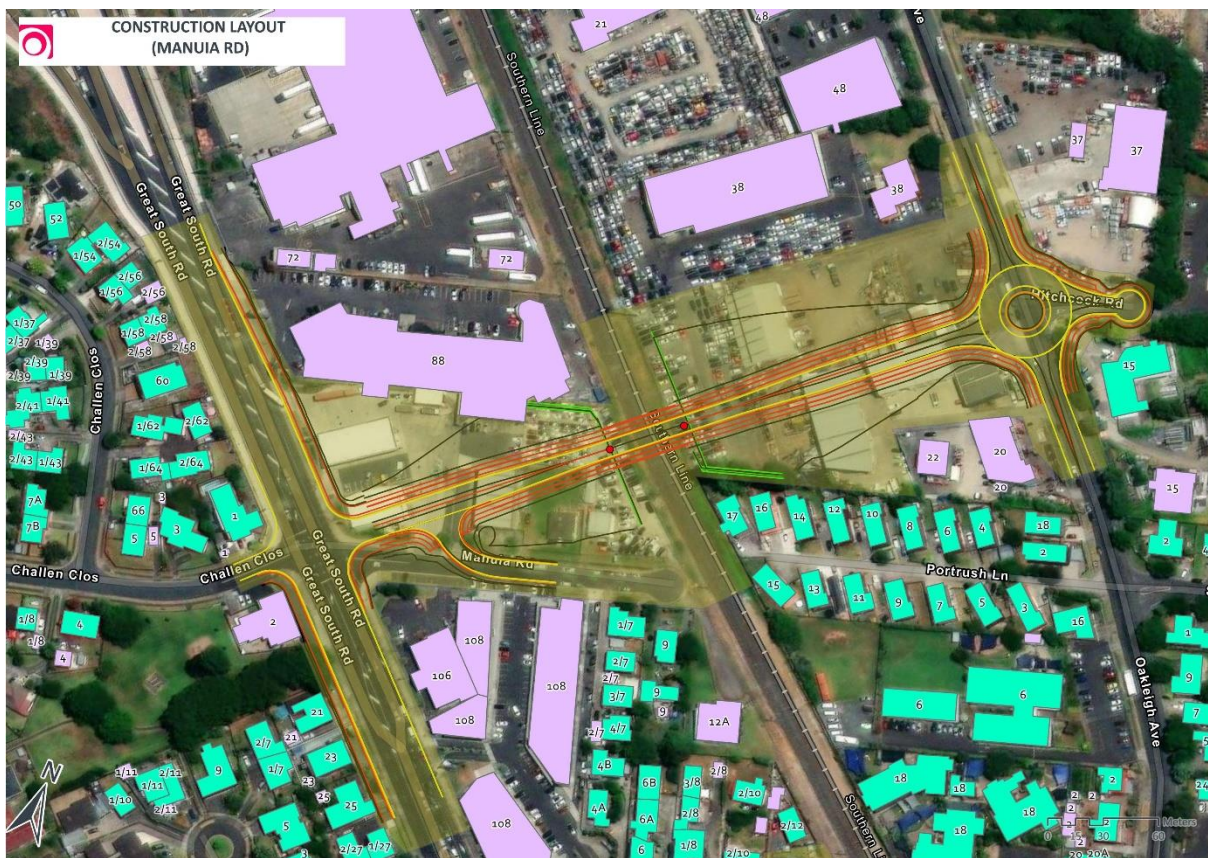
Indicative piling locations and designation overlay (Manuia Road)
